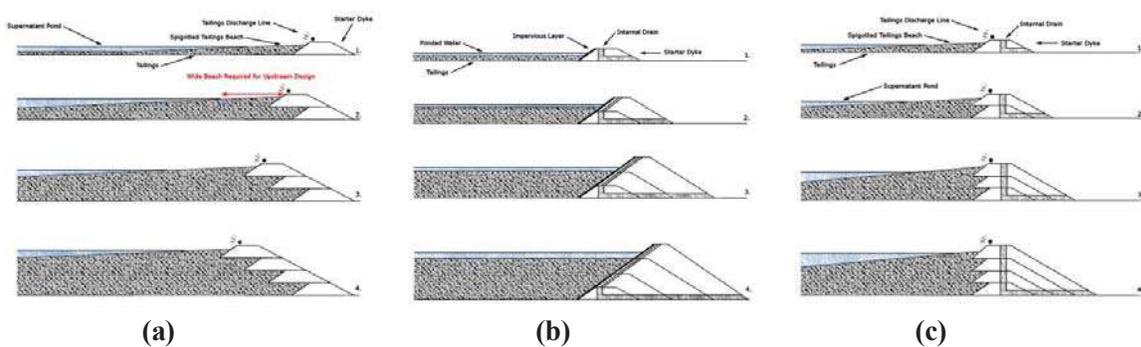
Various construction methods of ash dyke raising, (a) upstream, (b) downstream, and (c) centerline (Source: [www.tailings.info](http://www.tailings.info), © Jon Engels)
